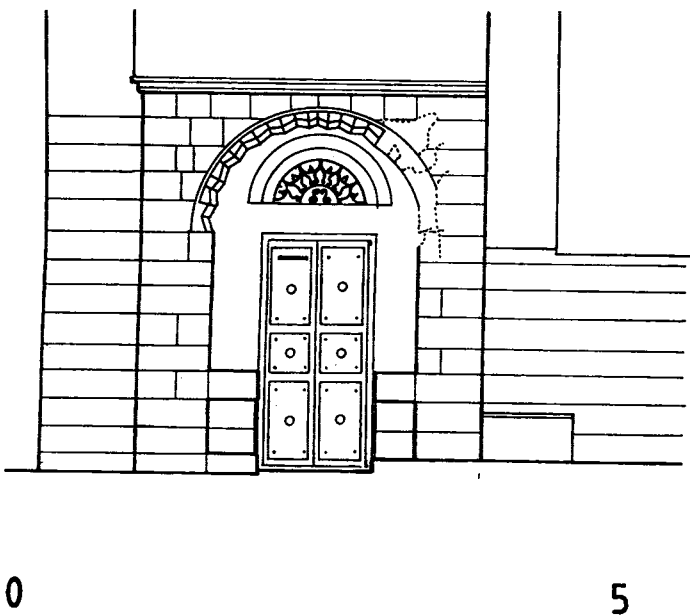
Elevation of the main street door of Bait Mamluk.
